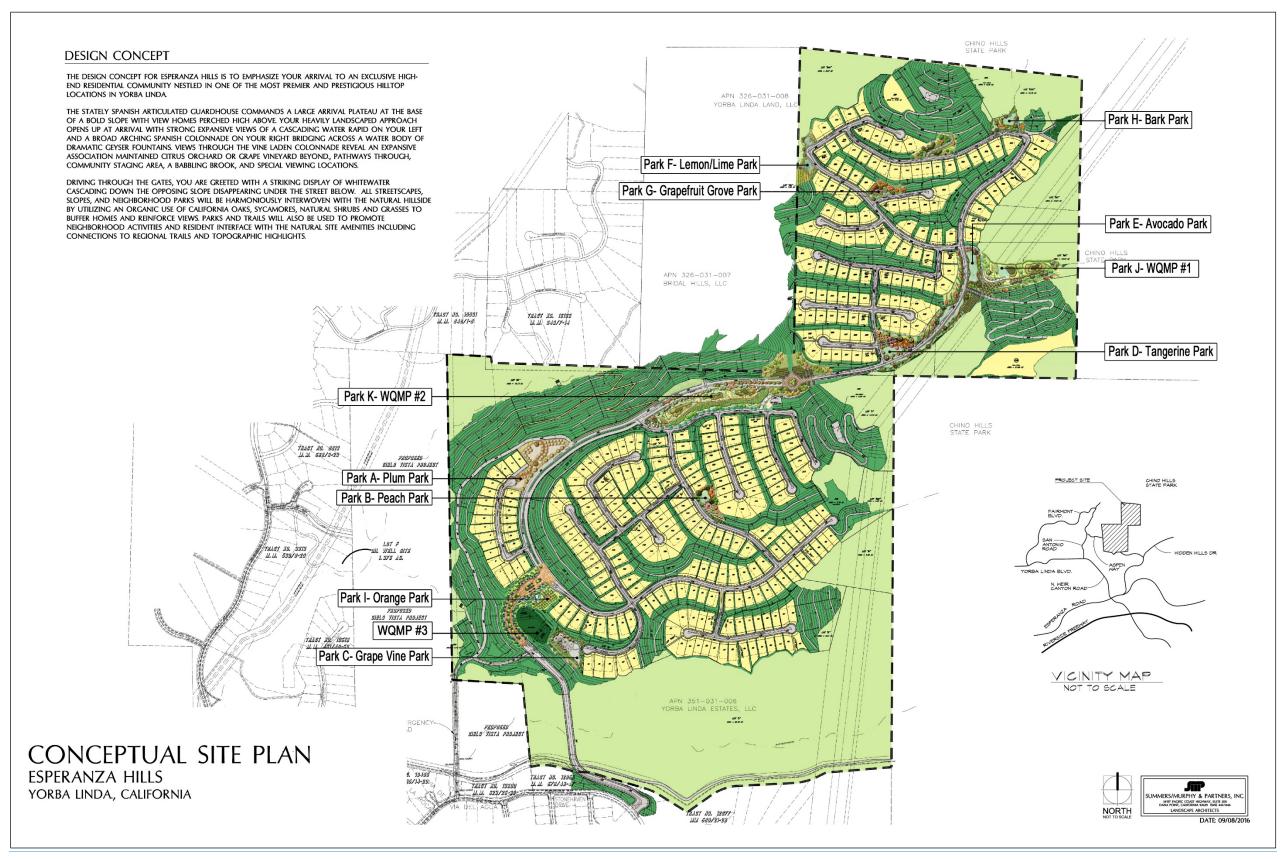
Exhibit 6 - Conceptual Site Plan, San Antonio Road Access Configuration
